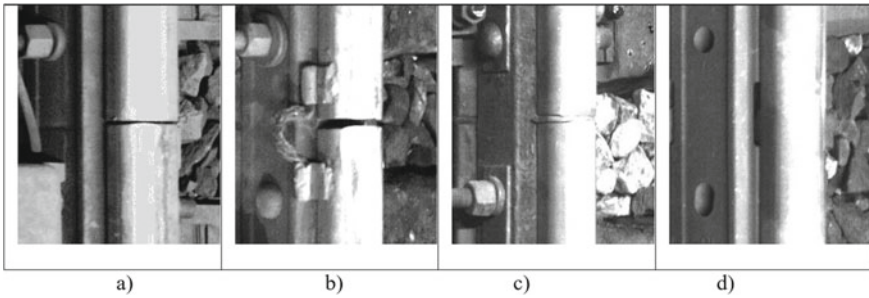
Rail joint types: a fish plate rail joint without connector, b fish plate rail joint with connector, c insulating joint, d welded joint
